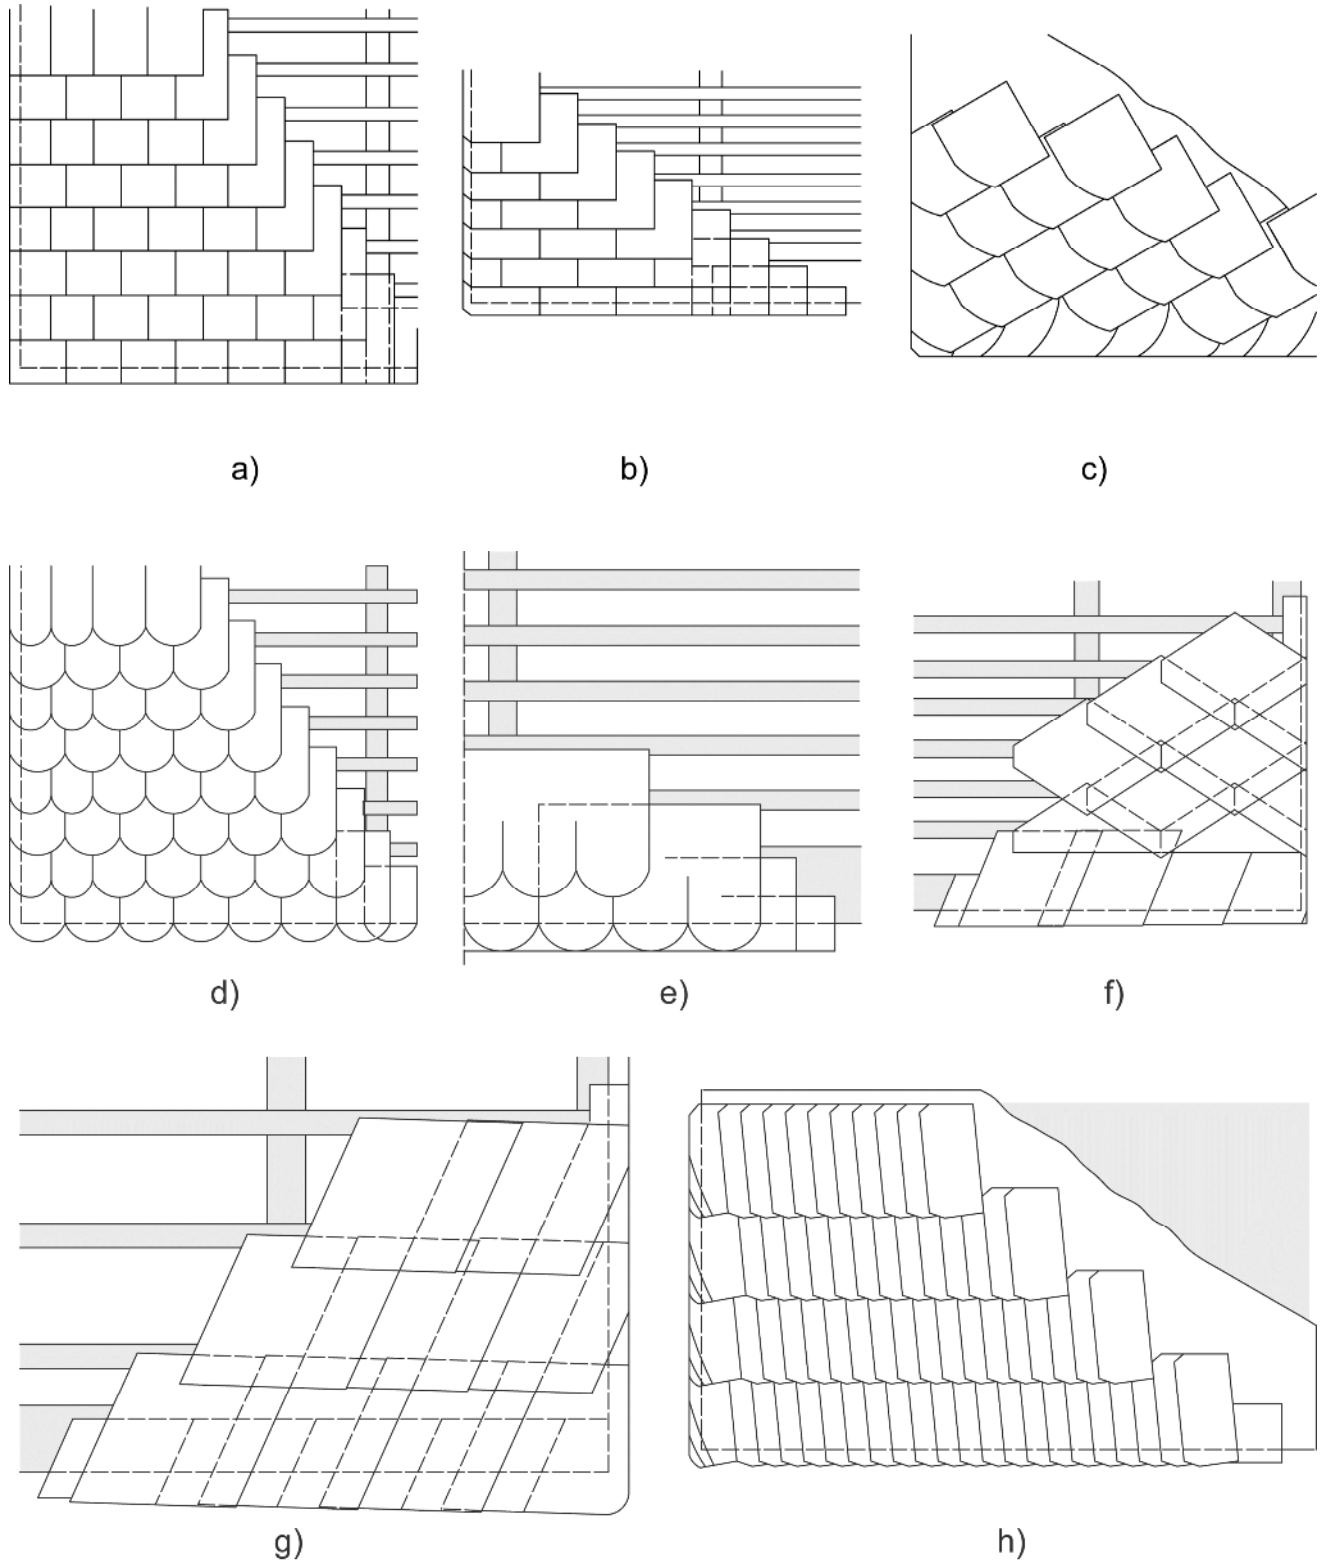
Examples of fibre-cement slates installed showing lines of fixing
